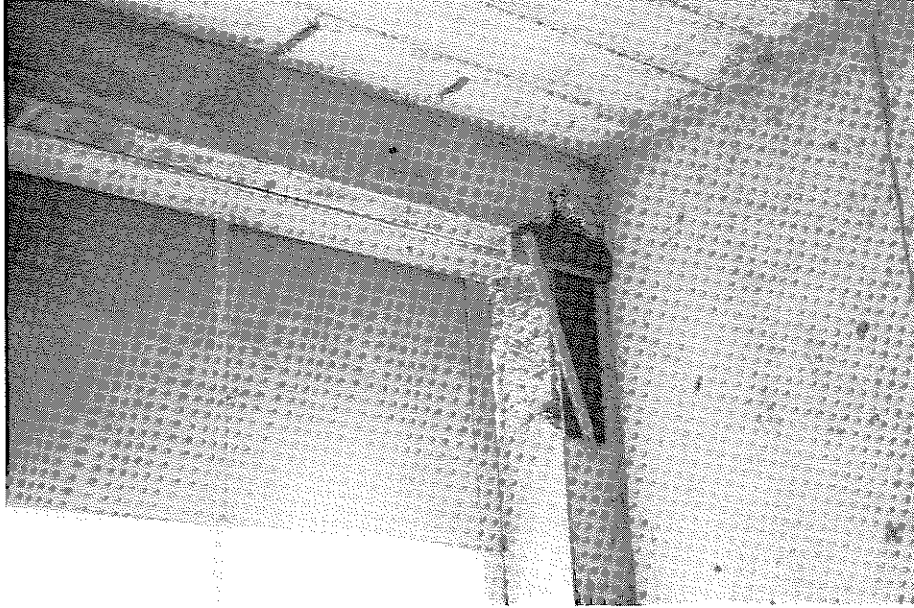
Spalling at connection between lightweight concrete beam and normal concrete column at the fourth story, Indian Hills Medical Center.
